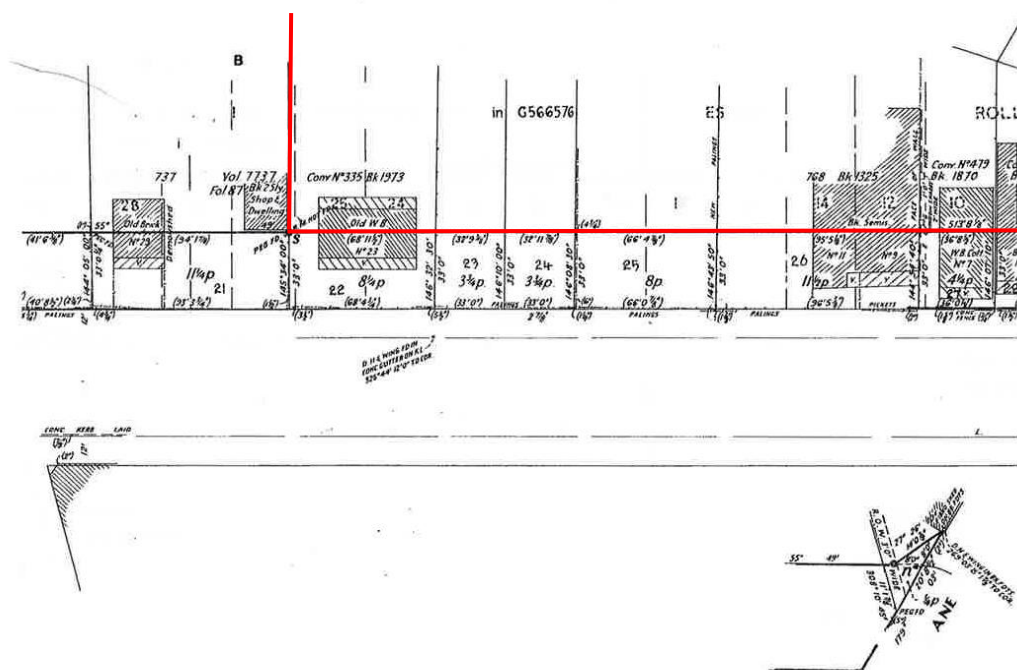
Detail of the southern side of the study area showing structures fronting Terminus Street and the lots affected by the provision for widening Terminus Street (Source: Department of Main Roads plans from Douglas Partners 2014)
